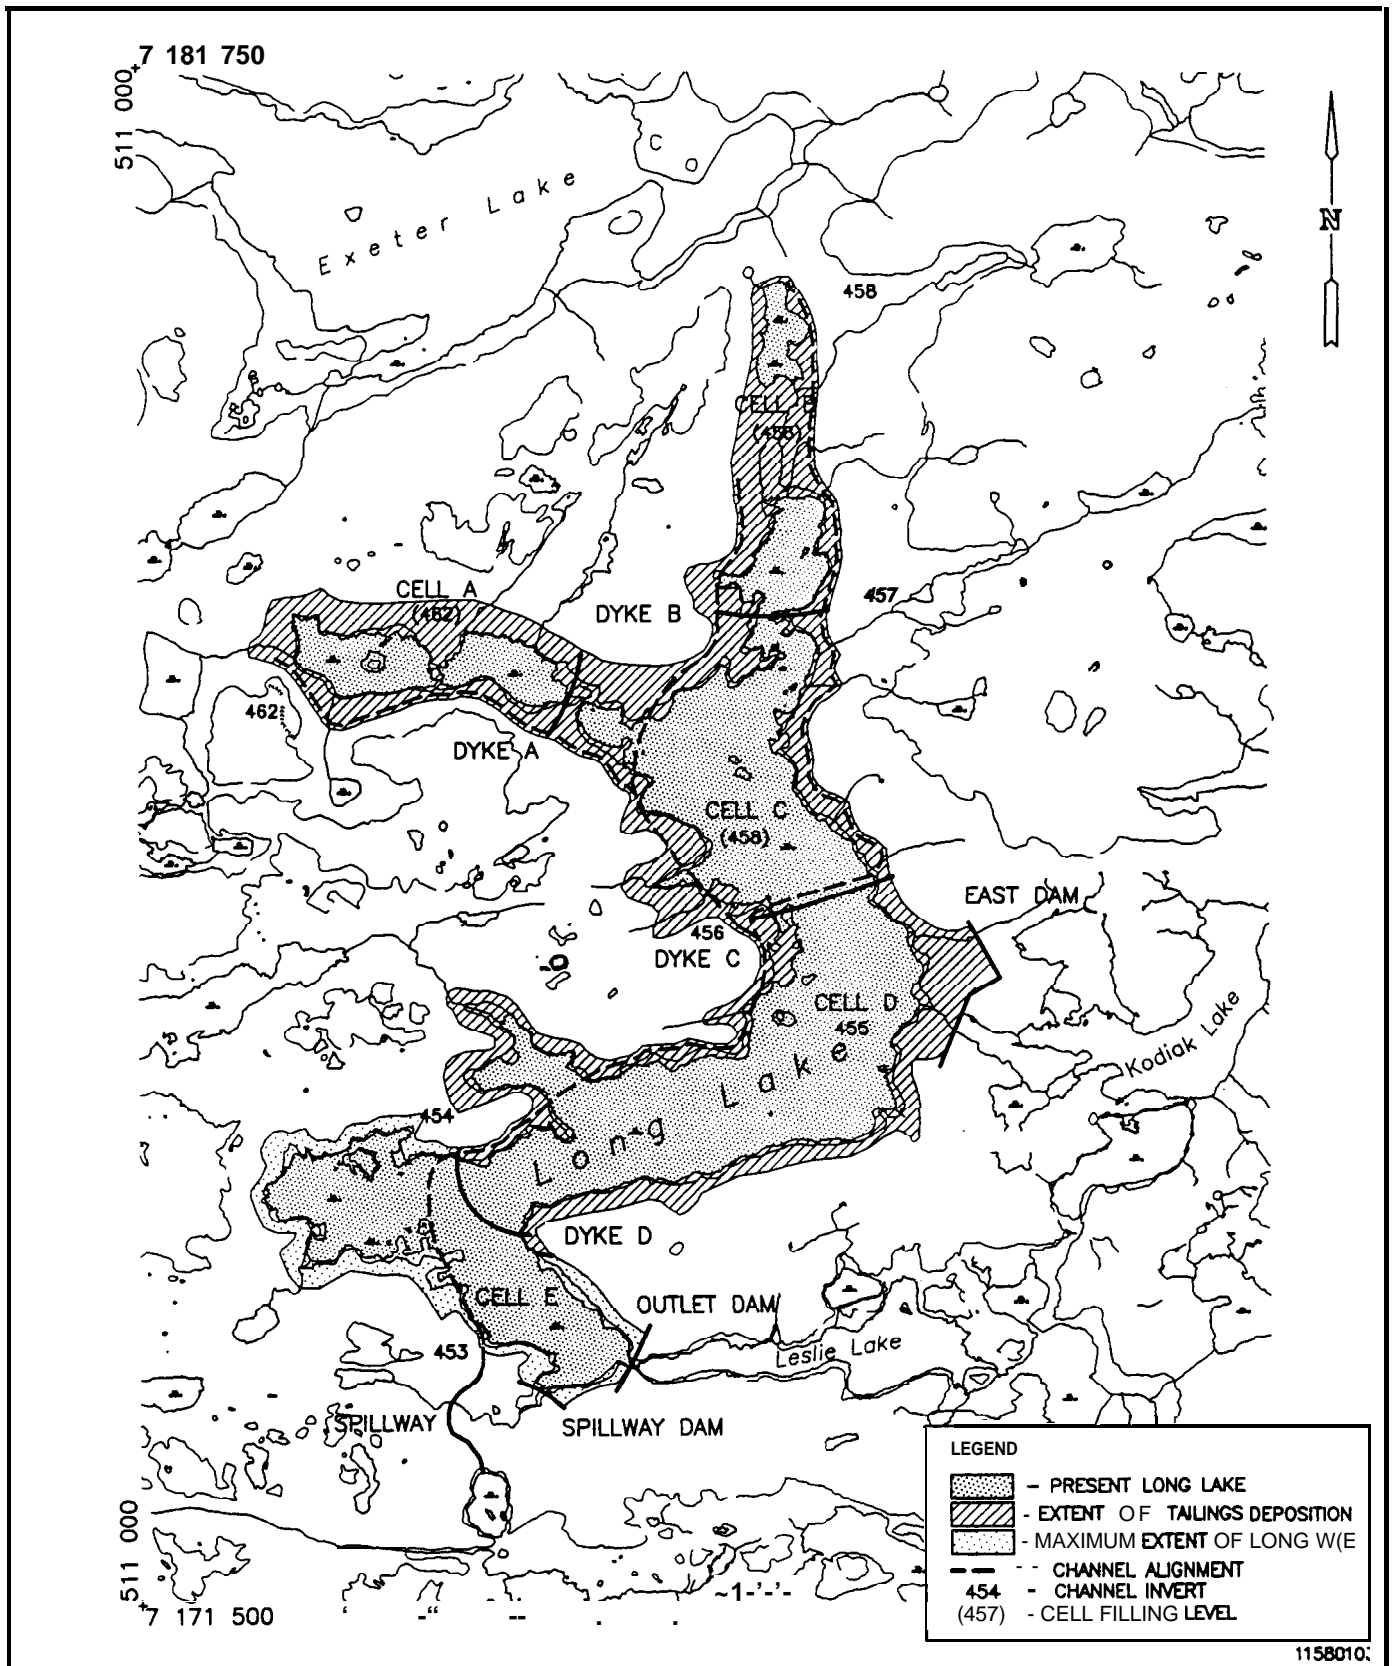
LAYOUT OF DRAINAGE CHANNELS AFTER RECLAMATION
